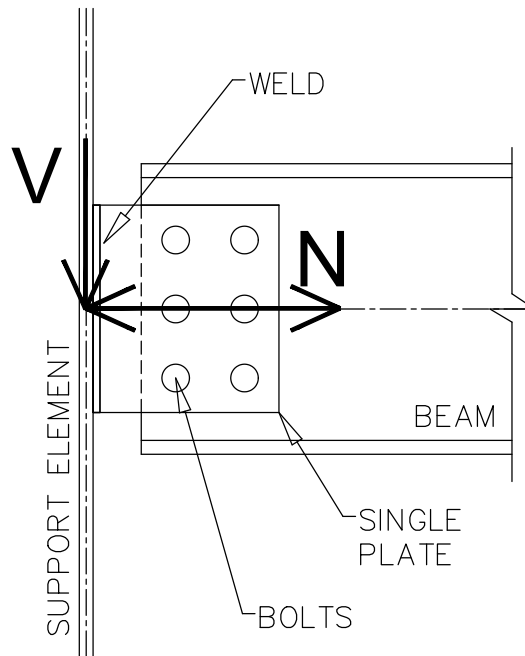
Typical Single-Plate Shear Connection Subject to Axial and Shear Force
